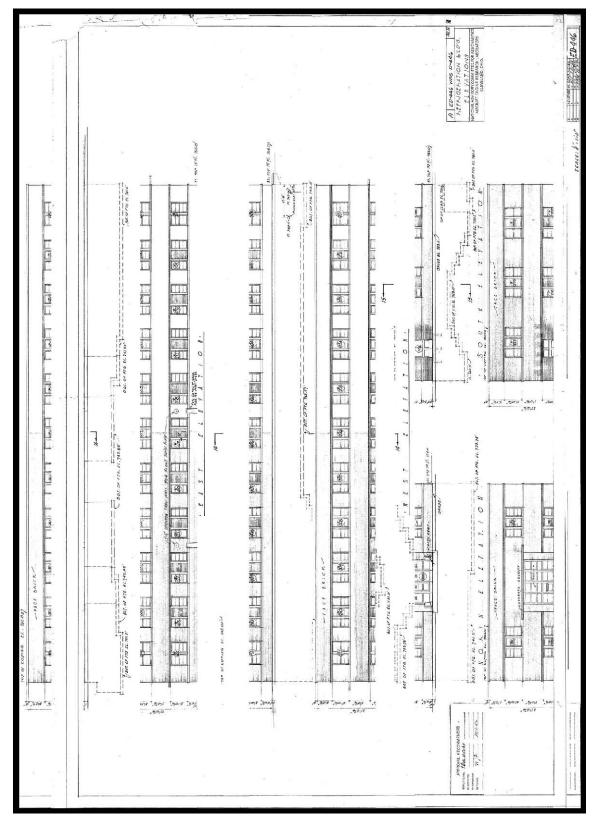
Elevation drawing of the Refrigeration Building, 1942 (OH_Cuyahoga_AWT-Support_057).
